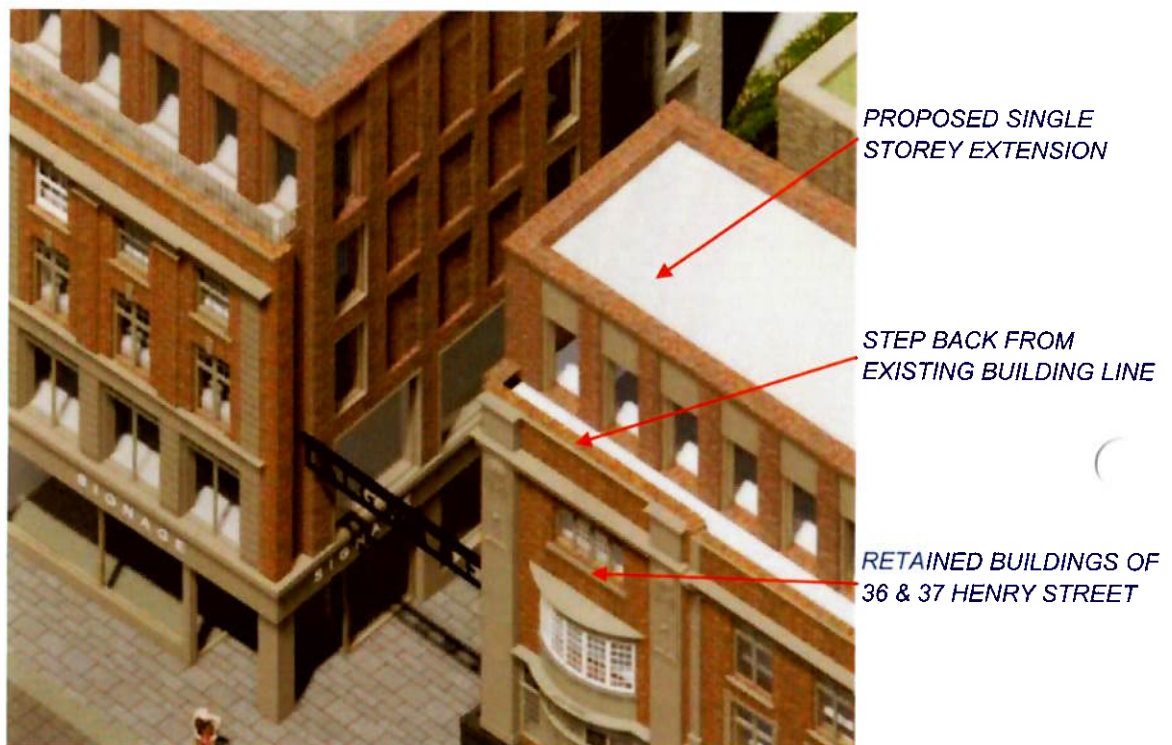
Proposed Single Storey Extension of Retained Buildings at 36 and 37 Henry Street
